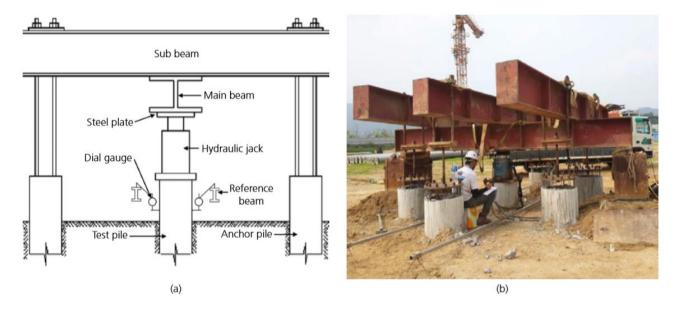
Plate load test system used around piles: (a) schematic diagram; (b) installation
